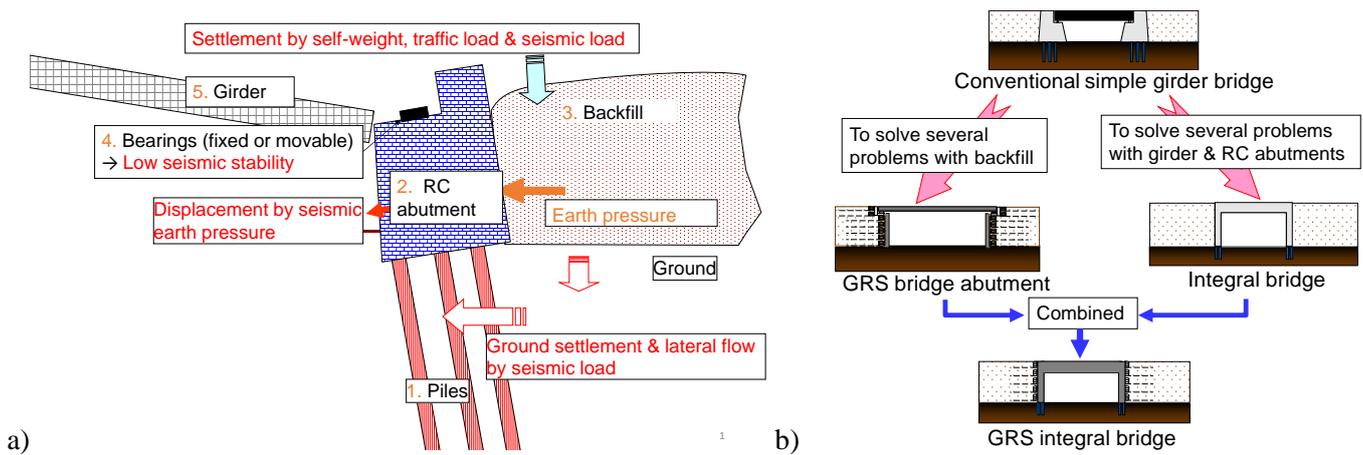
a) Typical serious problems with conventional type simple girder bridge; and b) development towards GRS Integral Bridge (Tatsuoka et al., 2009, 2016).
